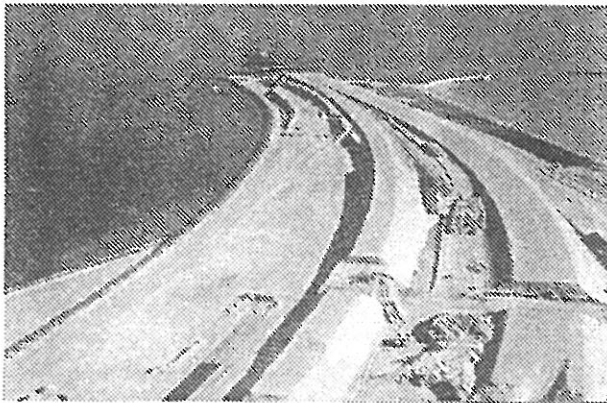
Approach ramps on Fyn to West Bridge railway and motor way
